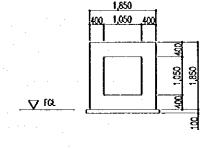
(2/3) Profile of Bypass Box Culvert
